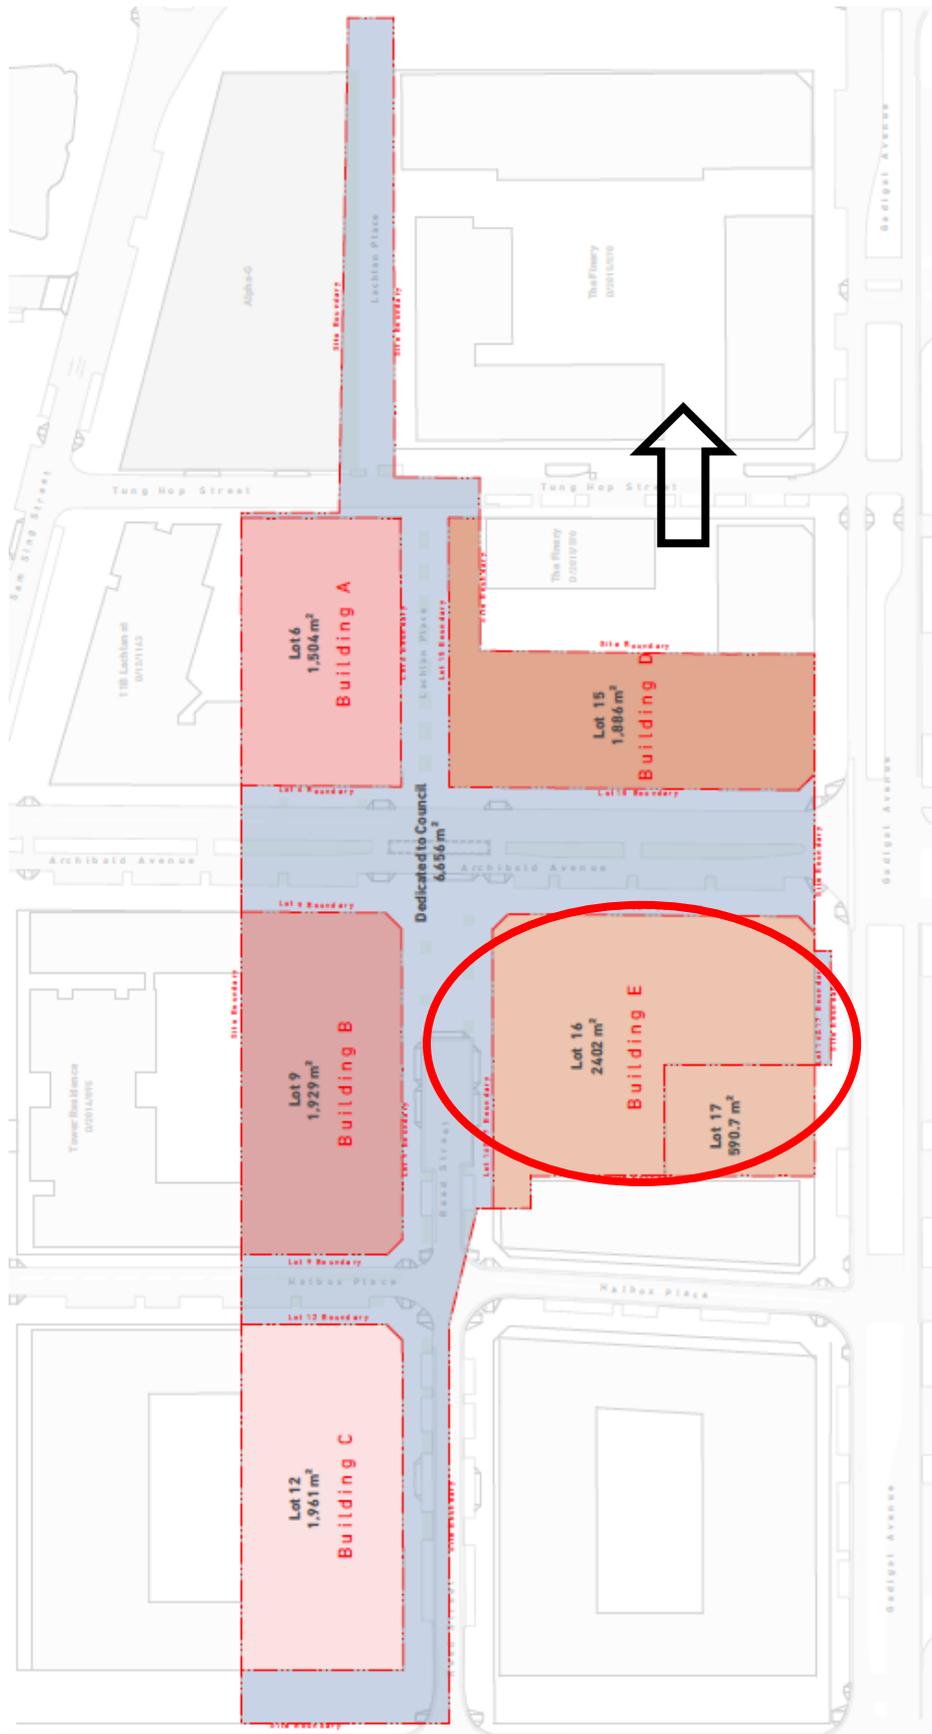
Concept DA approved subdivision layout and Building E location within the site
